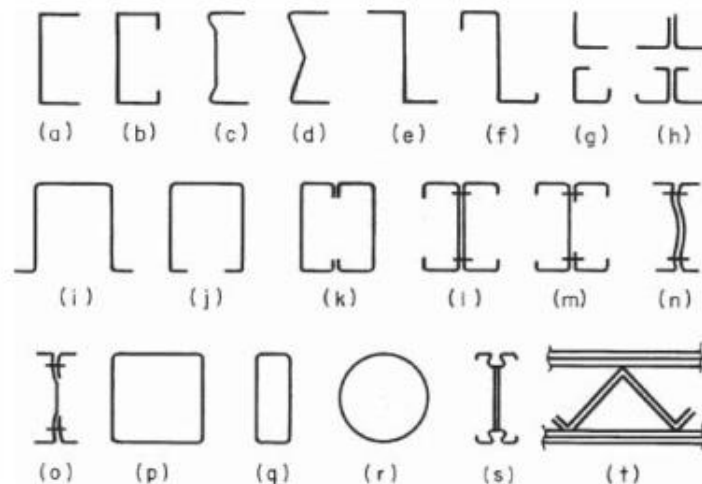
Cold-formed sections used in structural framing (Yu et al., 2019).
